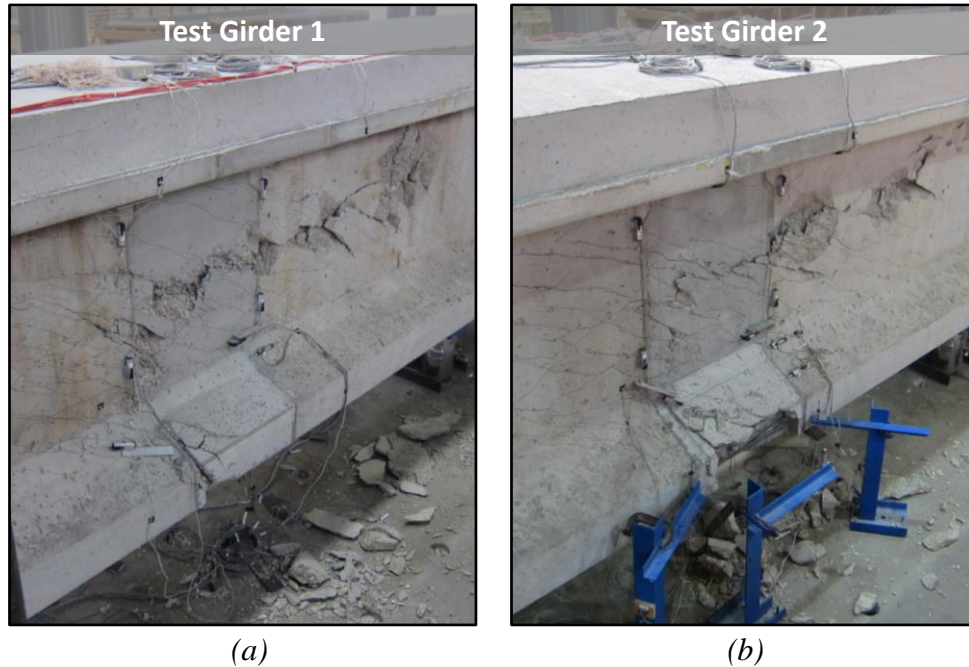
Test girders after failure – (a) Test Girder 1; (b) Test Girder 2
